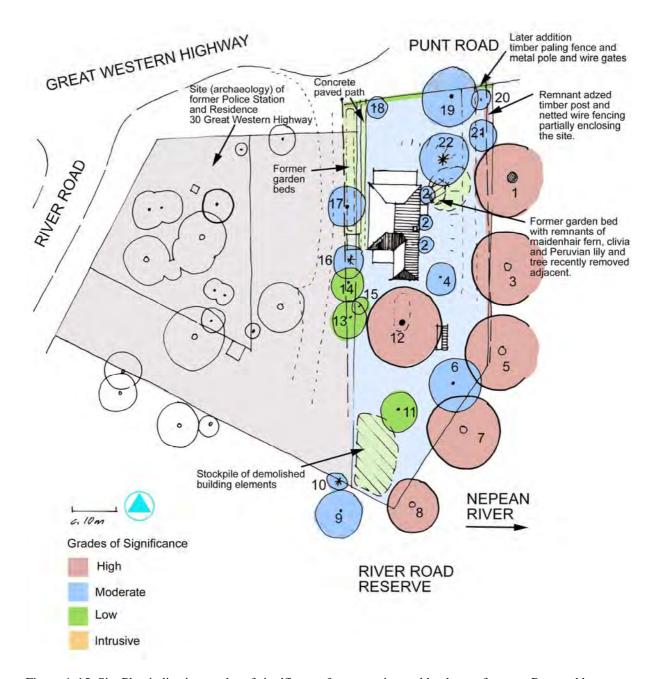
15: Site Plan indicating grades of significance for vegetation and landscape features. Prepared by Geoffrey Britton, 2020
